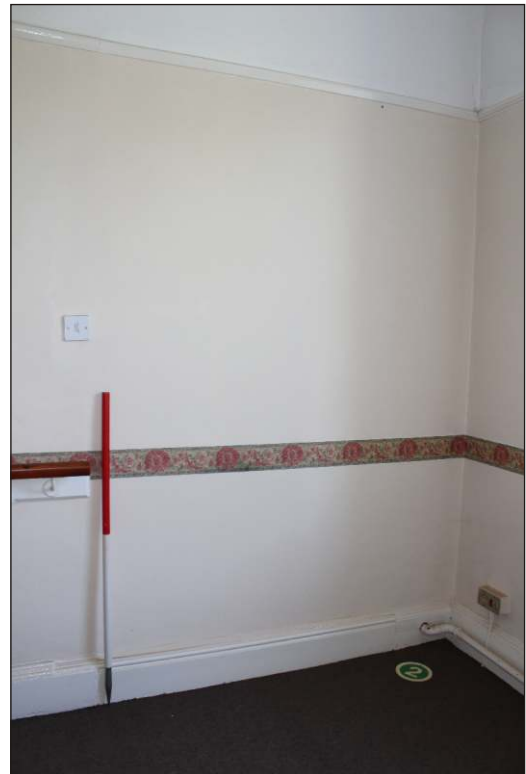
Landing 9a showing blocked doorway in south wall, looking southwest. (1m scale)
